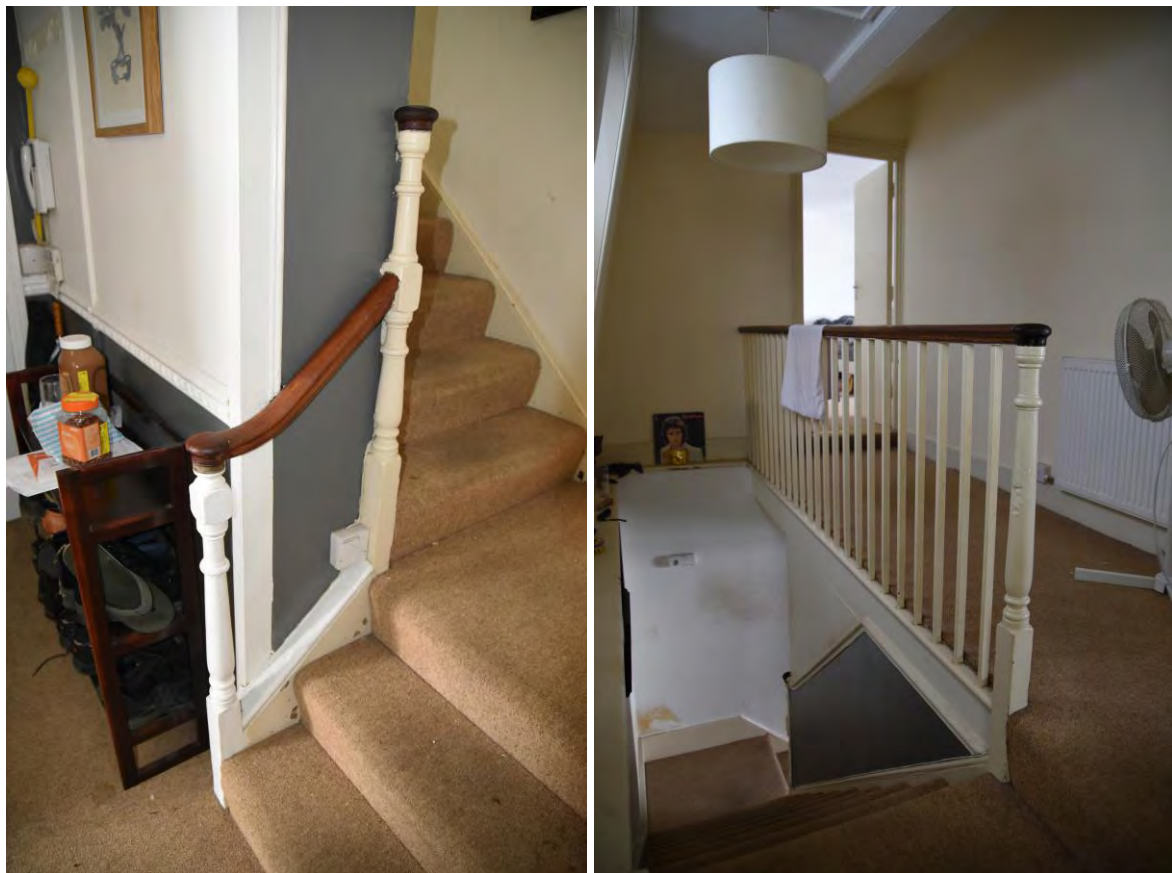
No. 25 Queen’s Road, suspected Phase 2 stair to third floor.
